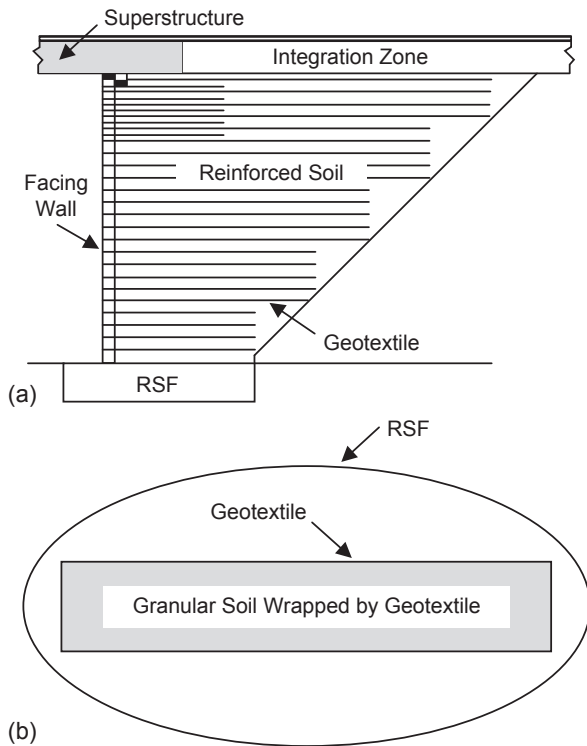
GRS-IBS structure: (a) Typical section view through a GRS bridge abutment, and (b) Reinforced soil foundation (RSF).
